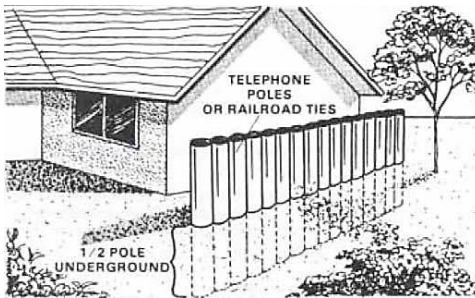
Barrier made of Telephone Poles or Railroad Ties
